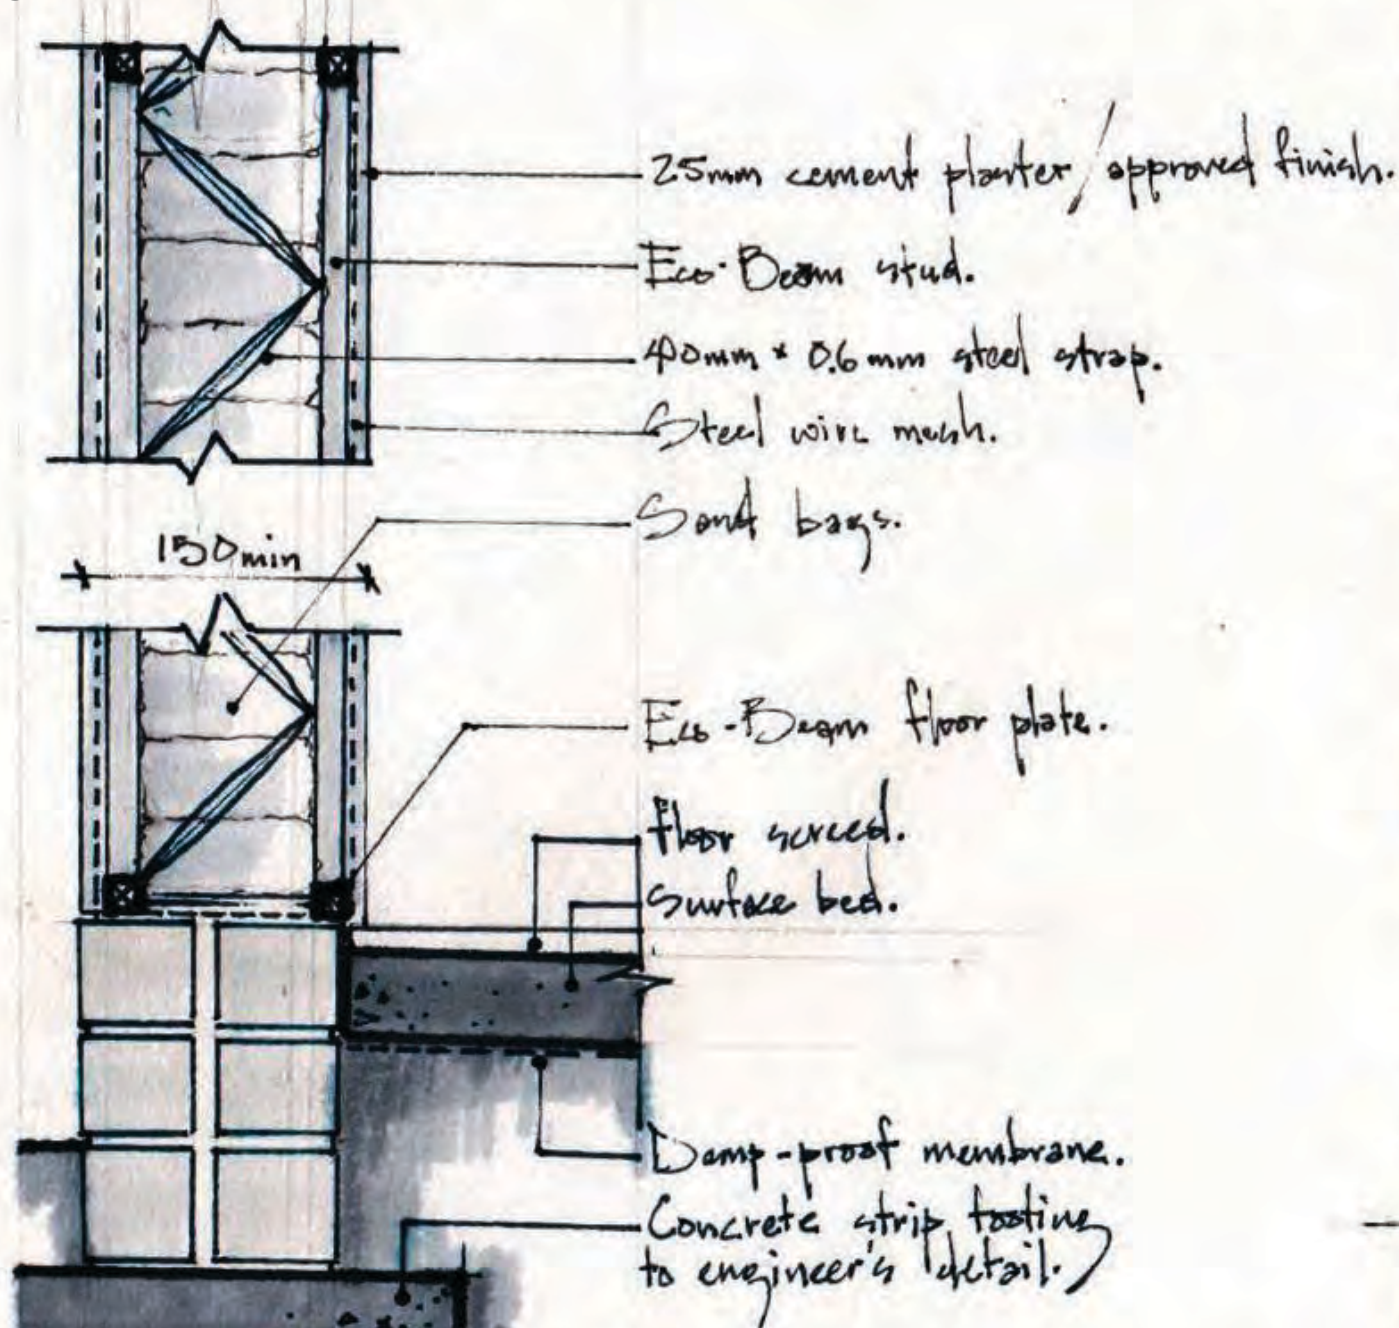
TYPICAL SECTION - FOUNDATION TO WALL
